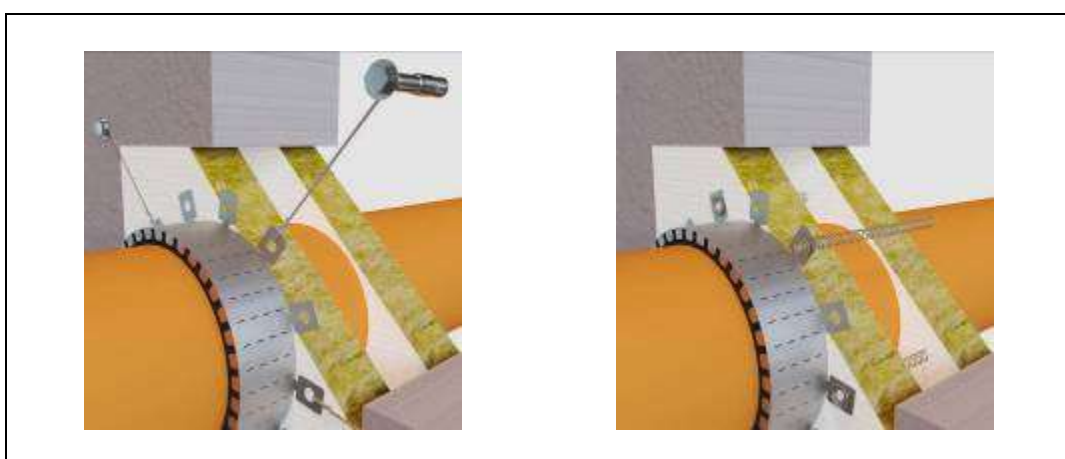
Fixing methods on PANEL – steel wires (left) and pigtail screws (right).
